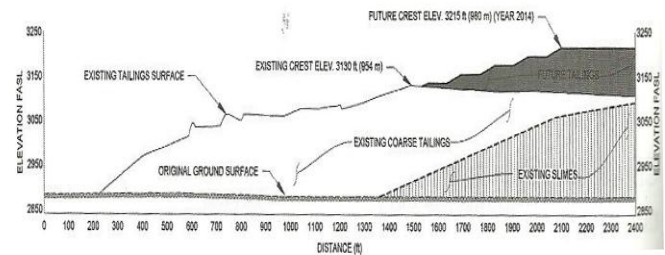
Existing tailings dam and future raise location (Anderson & Eldridge, 2011).
